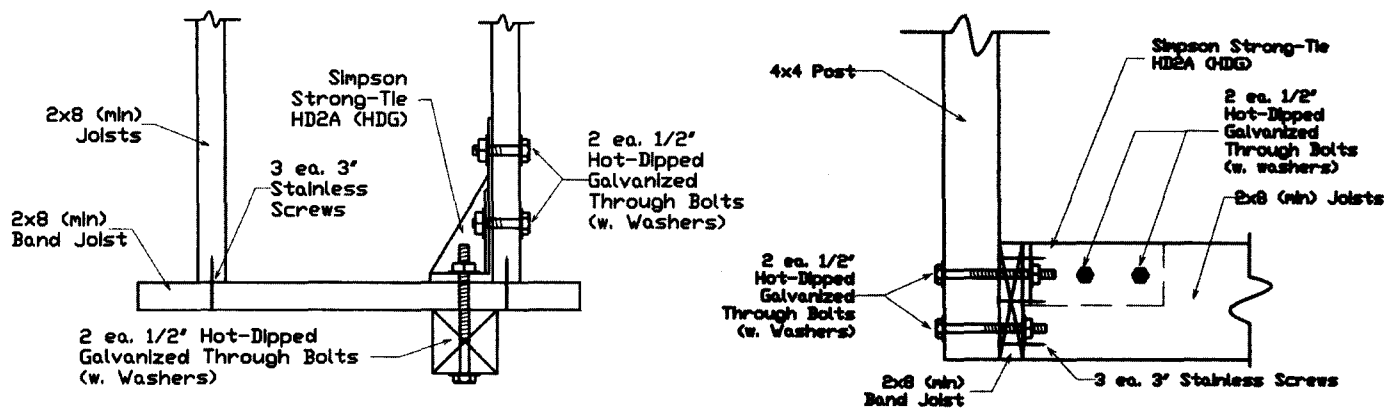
Guardrail post test assembly details for 4 by 4 southern pine posts outside of band joist.
